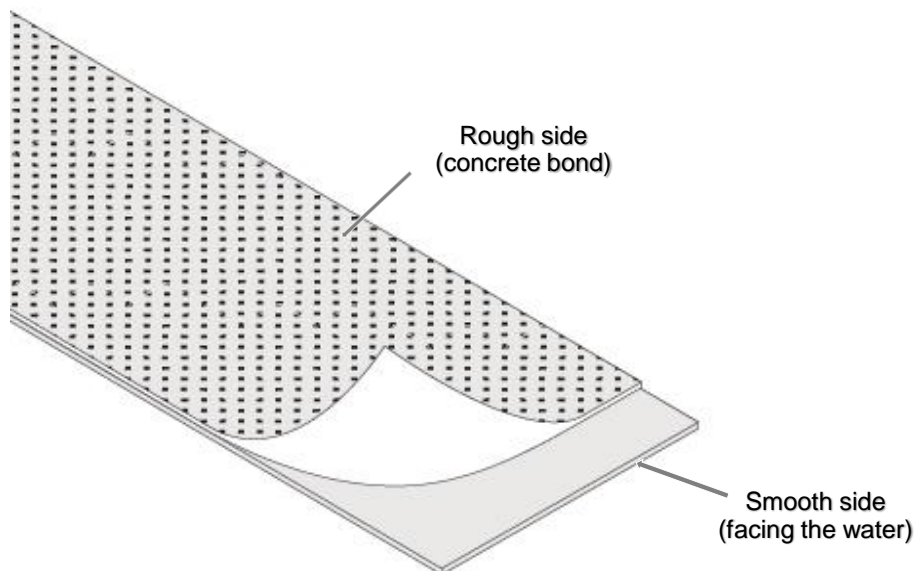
An example of fully bonded, pre-applied flexible sheet for waterproofing
